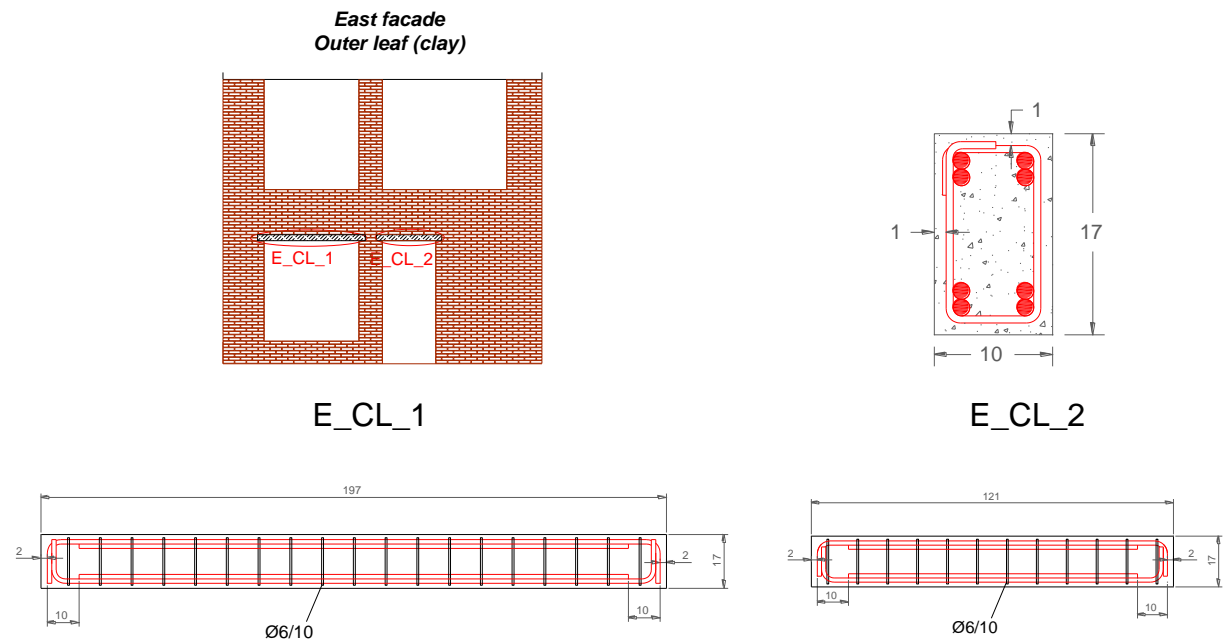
Reinforced concrete lintel details: East facade outer leaf. Units of cm.
